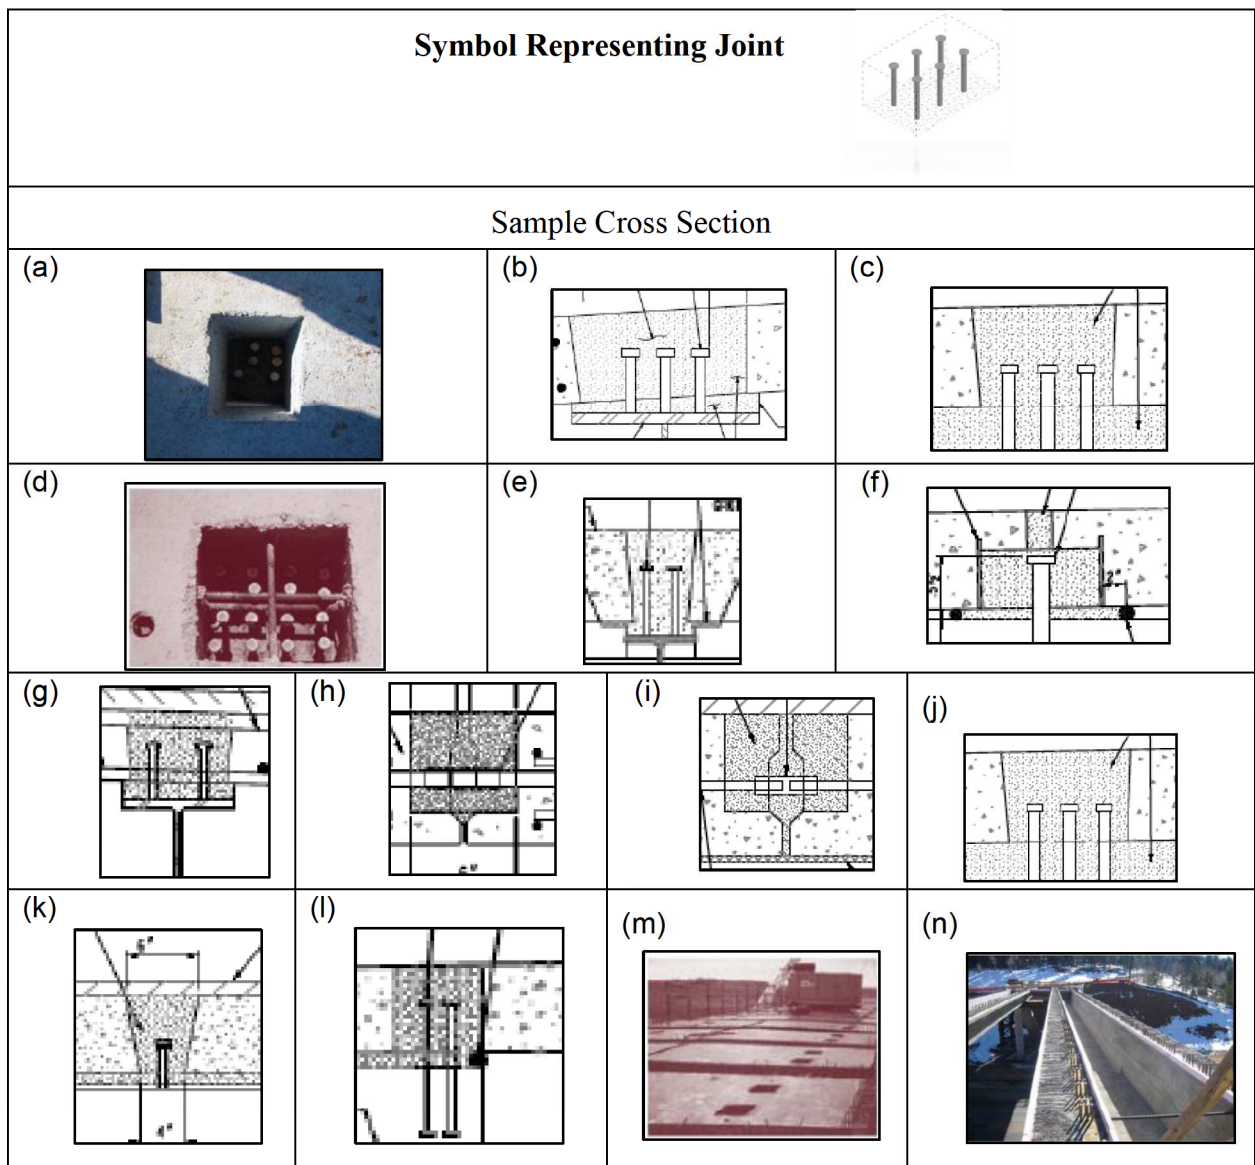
Type 5 Joint on a bridge deck [7], [9]
